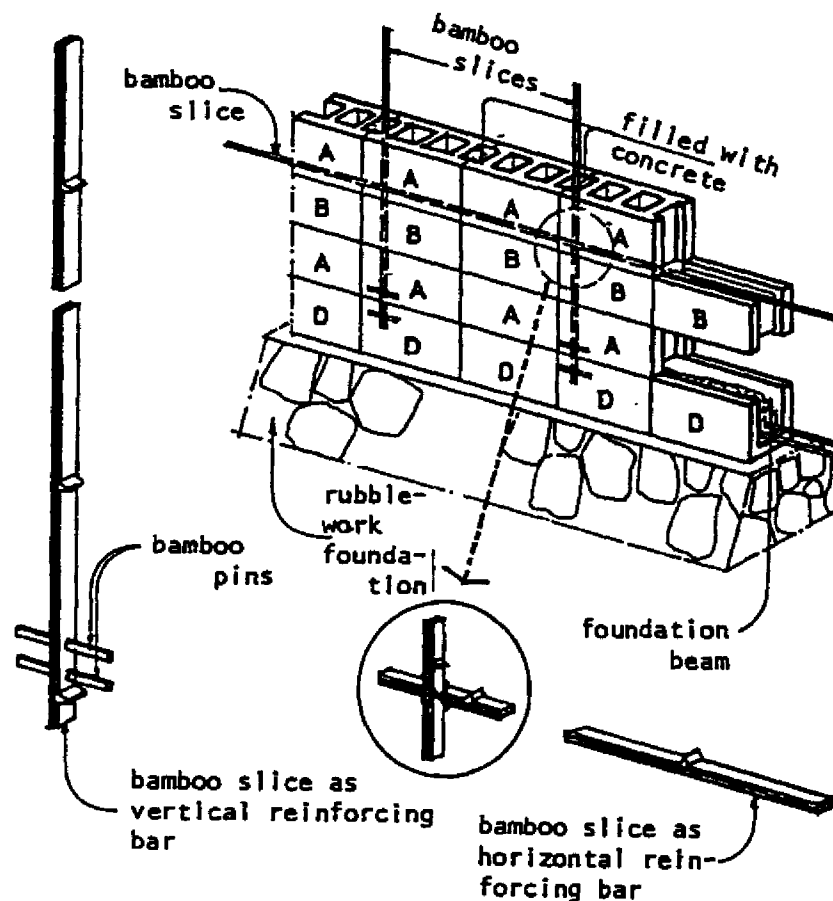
Sliced Bamboo Reinforcement of Hollow Block masonry [4].
